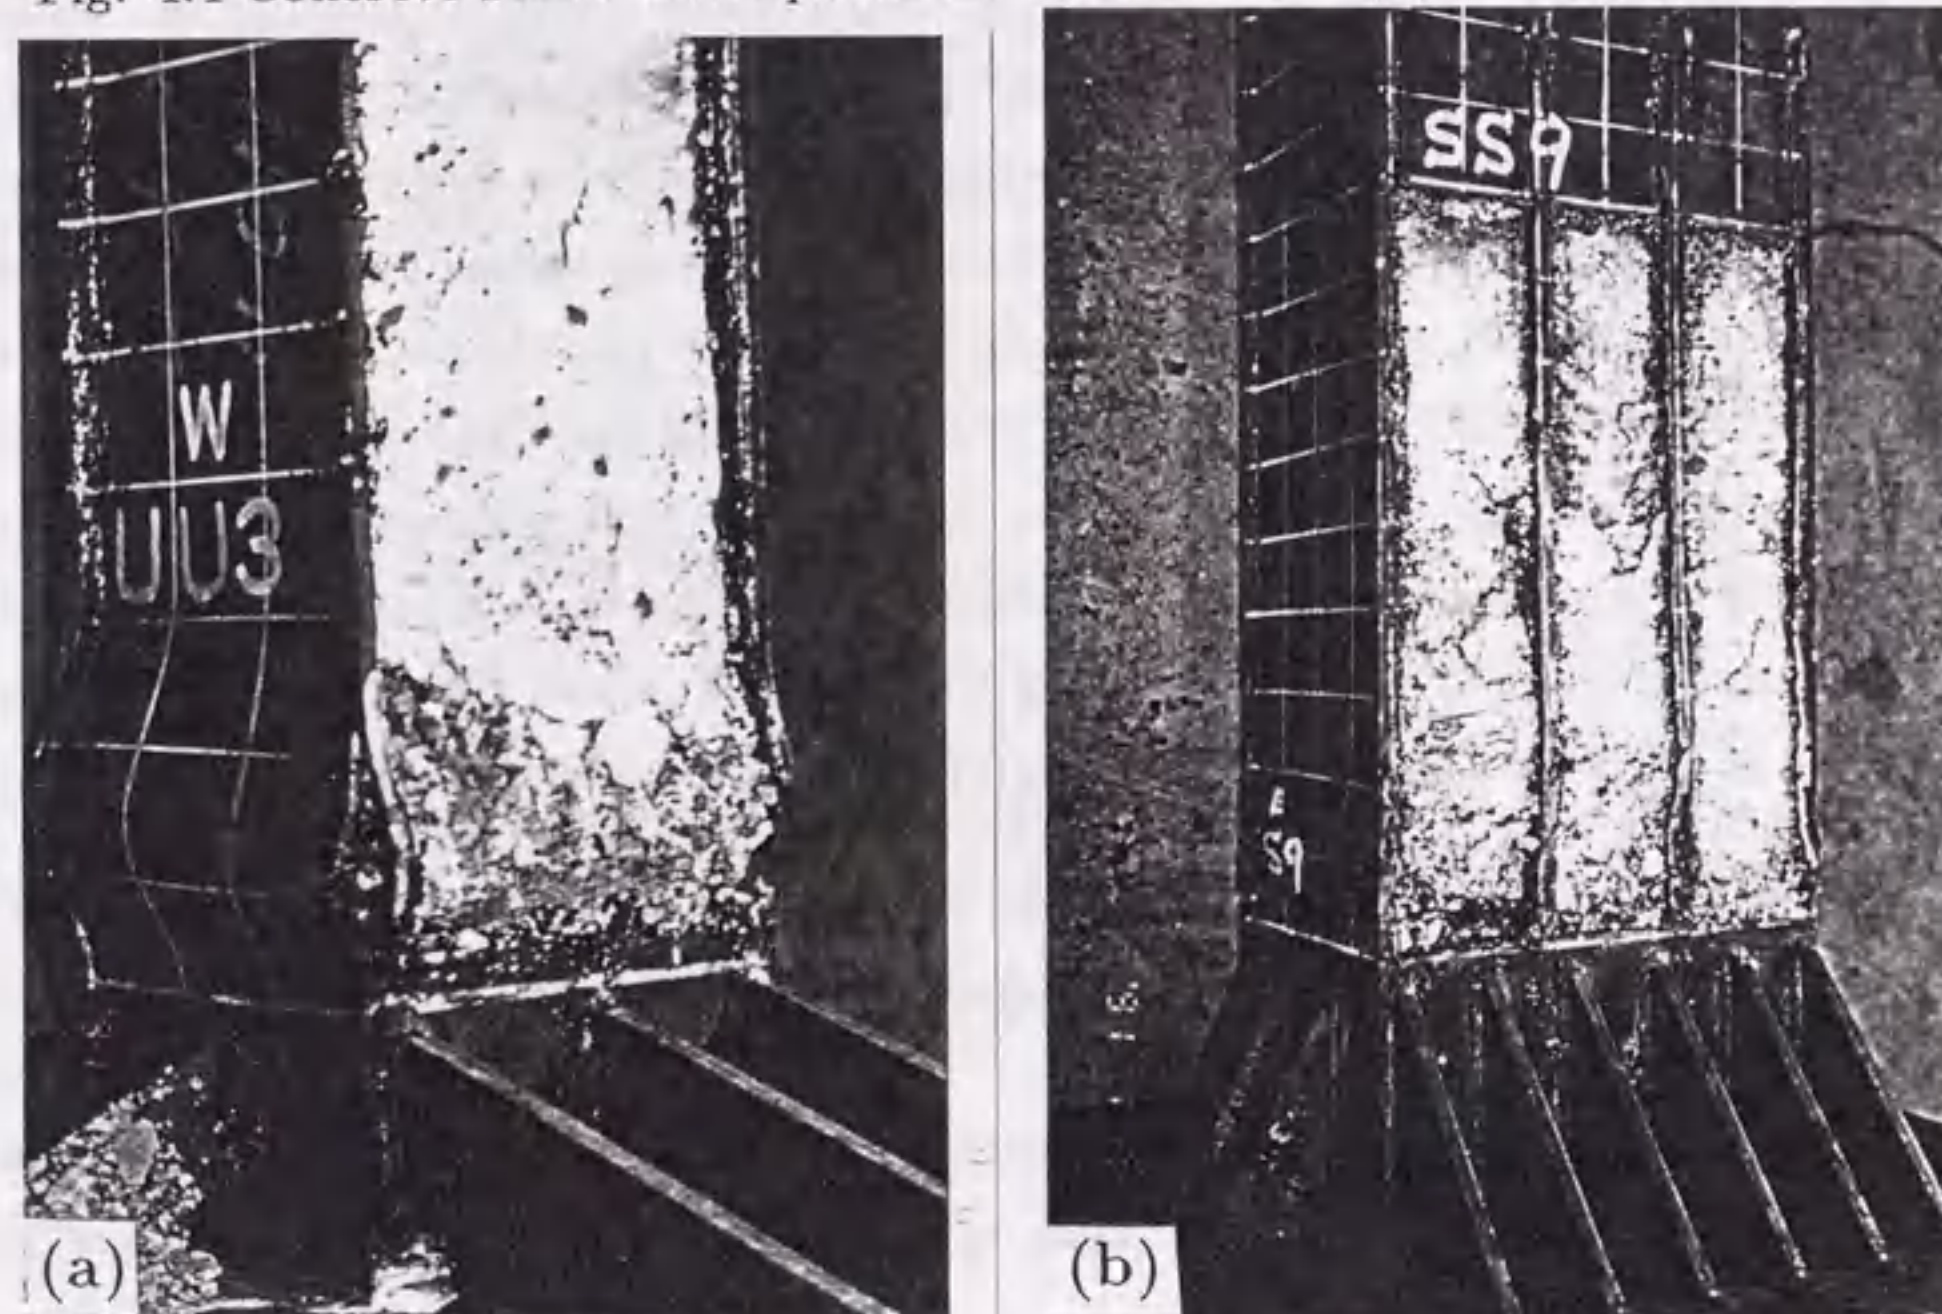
Typical Failure Appearances of Filled-in Concrete: (a) UU3; (b) SS9
